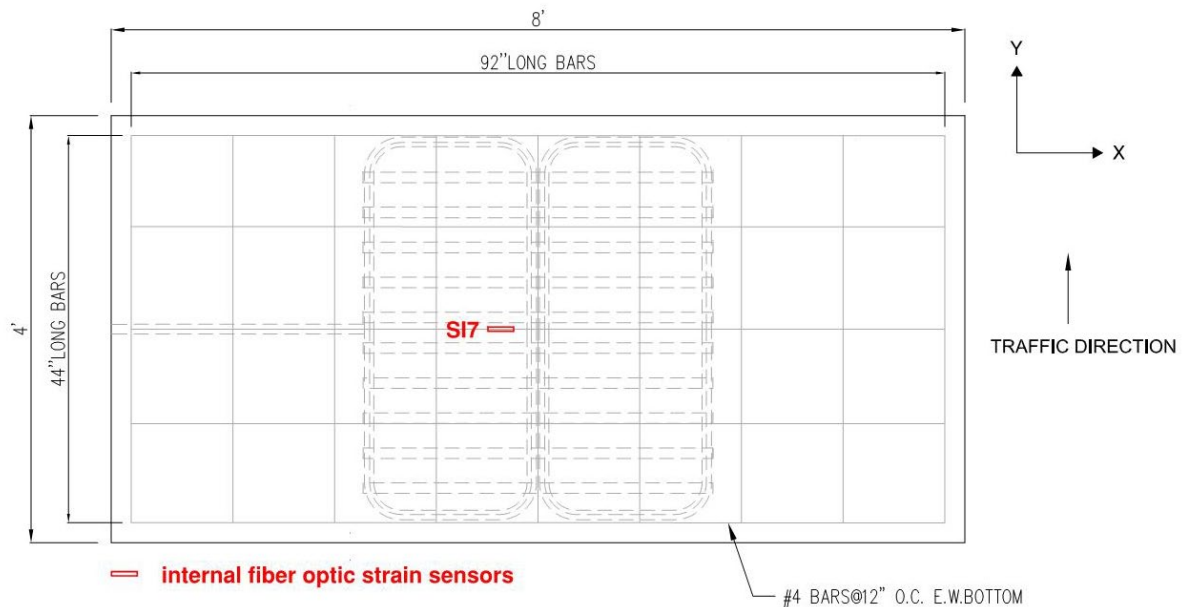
Instrumentation plan for typical panels – bottom mat of reinforcement, plan view
